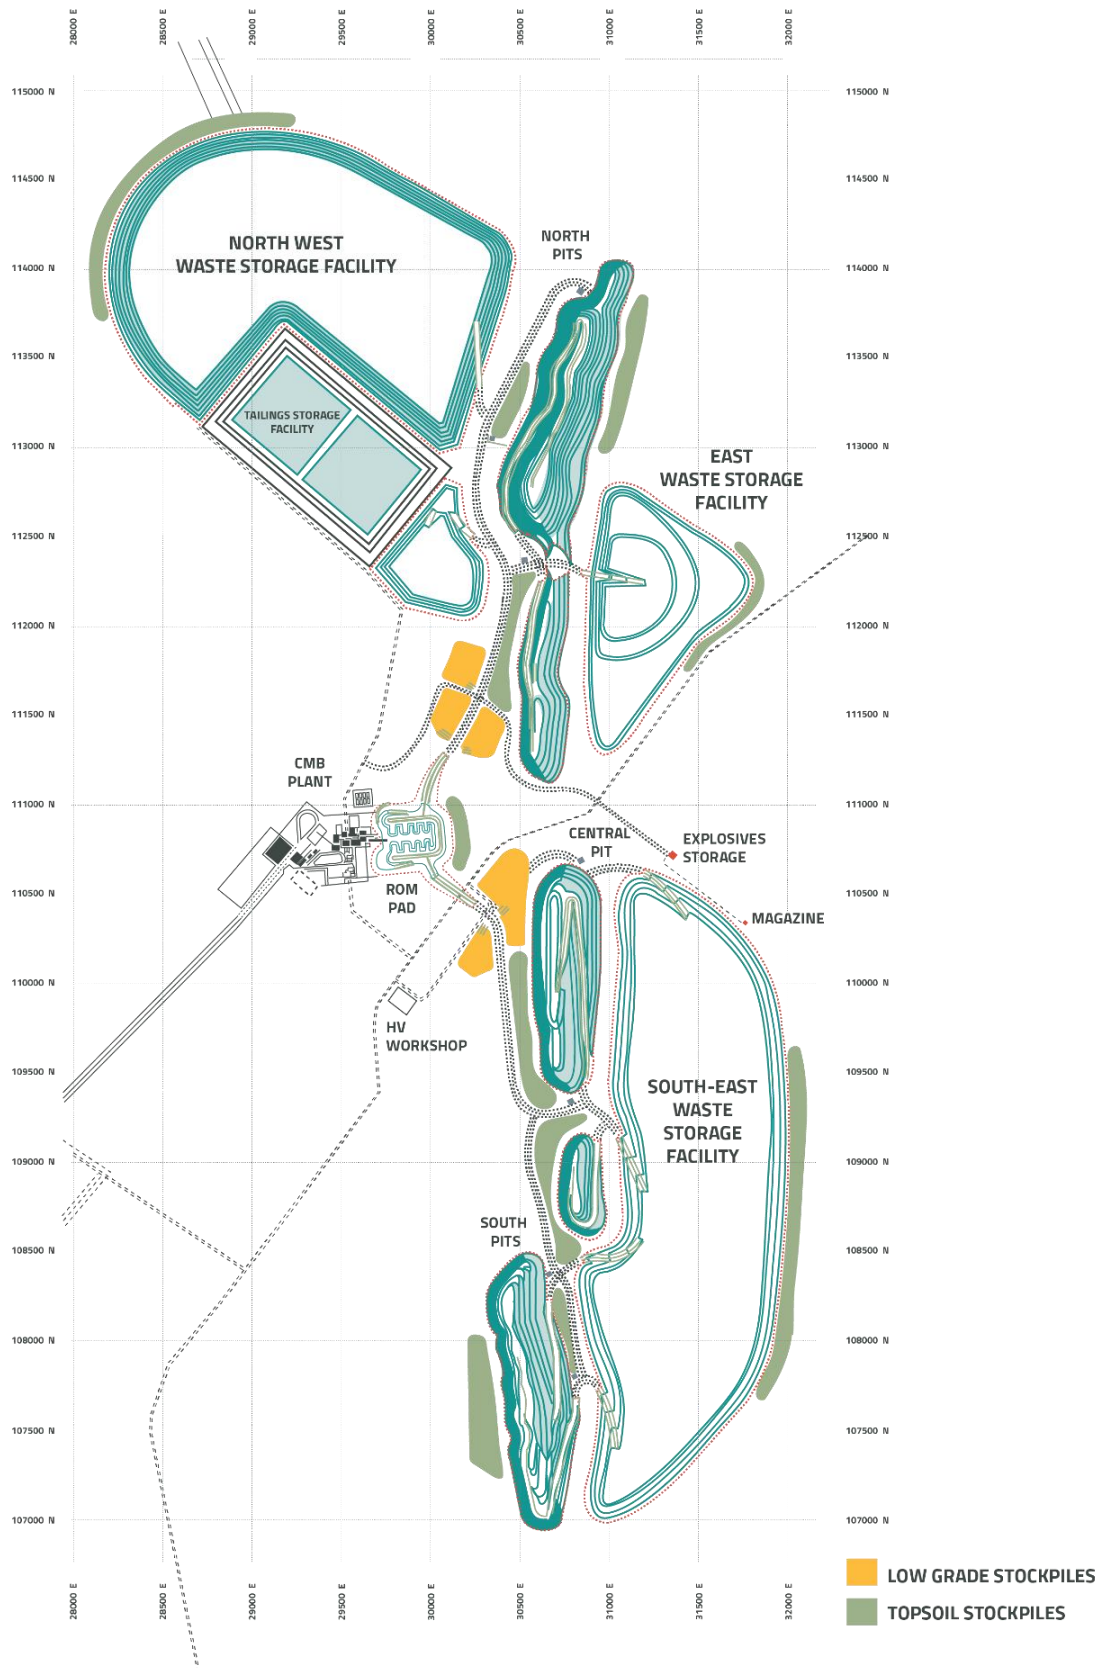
Site General Arrangement – Plan view including ultimate pits, Waste Storage Facilities, haul roads, ROM pad, long term stockpiles, CMB plant, Tailings Storage Facility, topsoil stockpile locations and public road with proposed diversion
